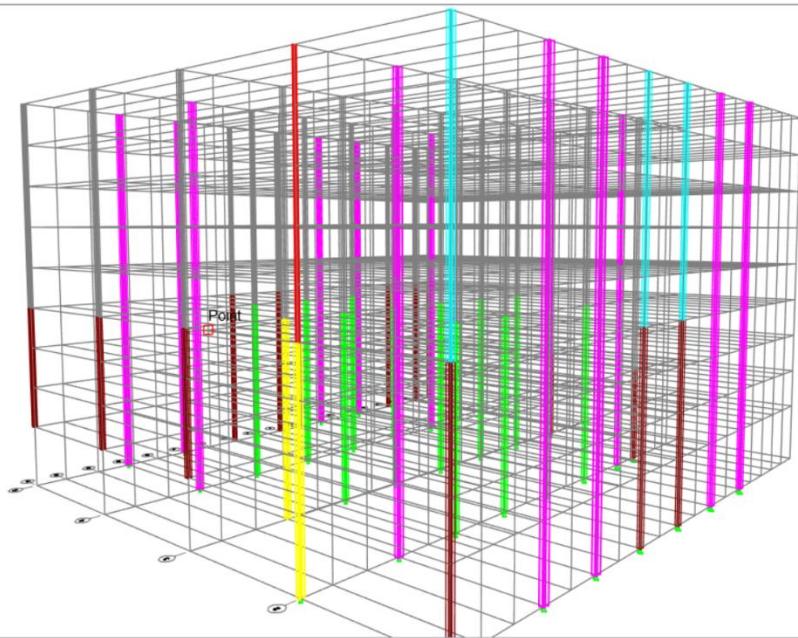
Figure showing the Proposed Column Sizes (Proposal 1)
